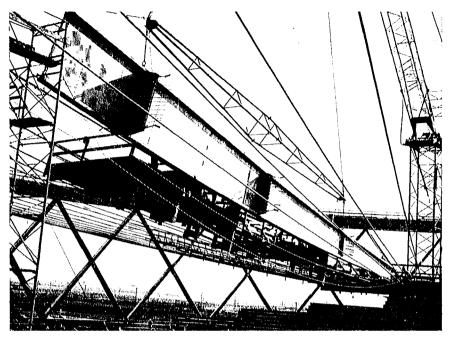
Radial stiffening roof framing rib, Oakland Coliseum, Oakland, Calif.
